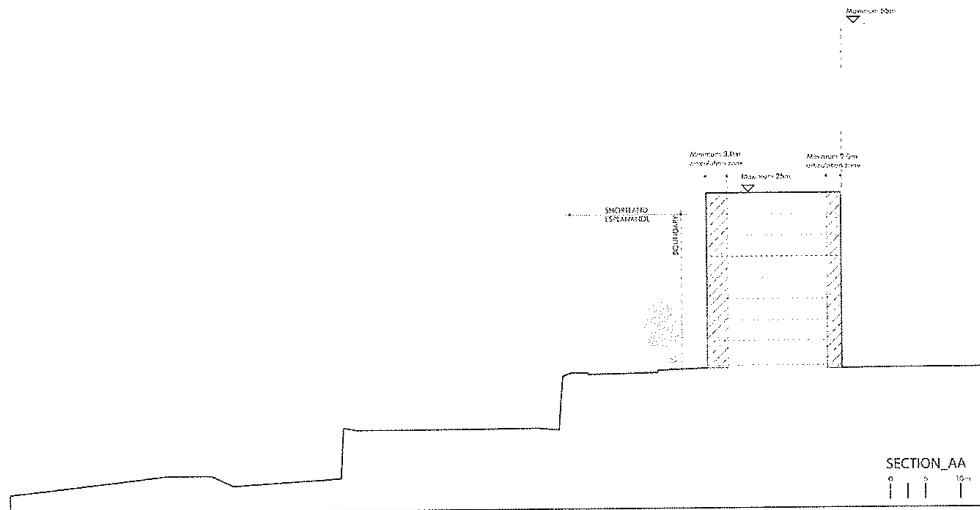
Shortland Esplanade 1 typical street cross-section A-A
